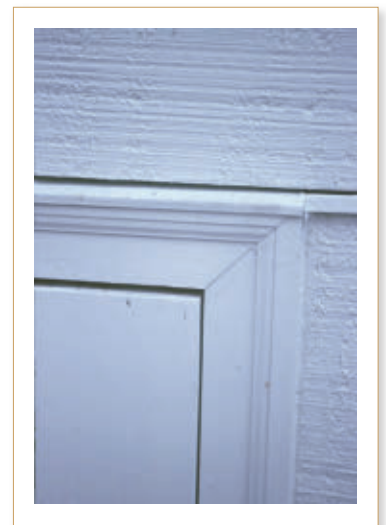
Corner of door showing flashing above the door’s head casing, z-flashing at the horizontal joint between the sheets of plywood panel siding, and sealant between siding and the door’s jamb casing.
